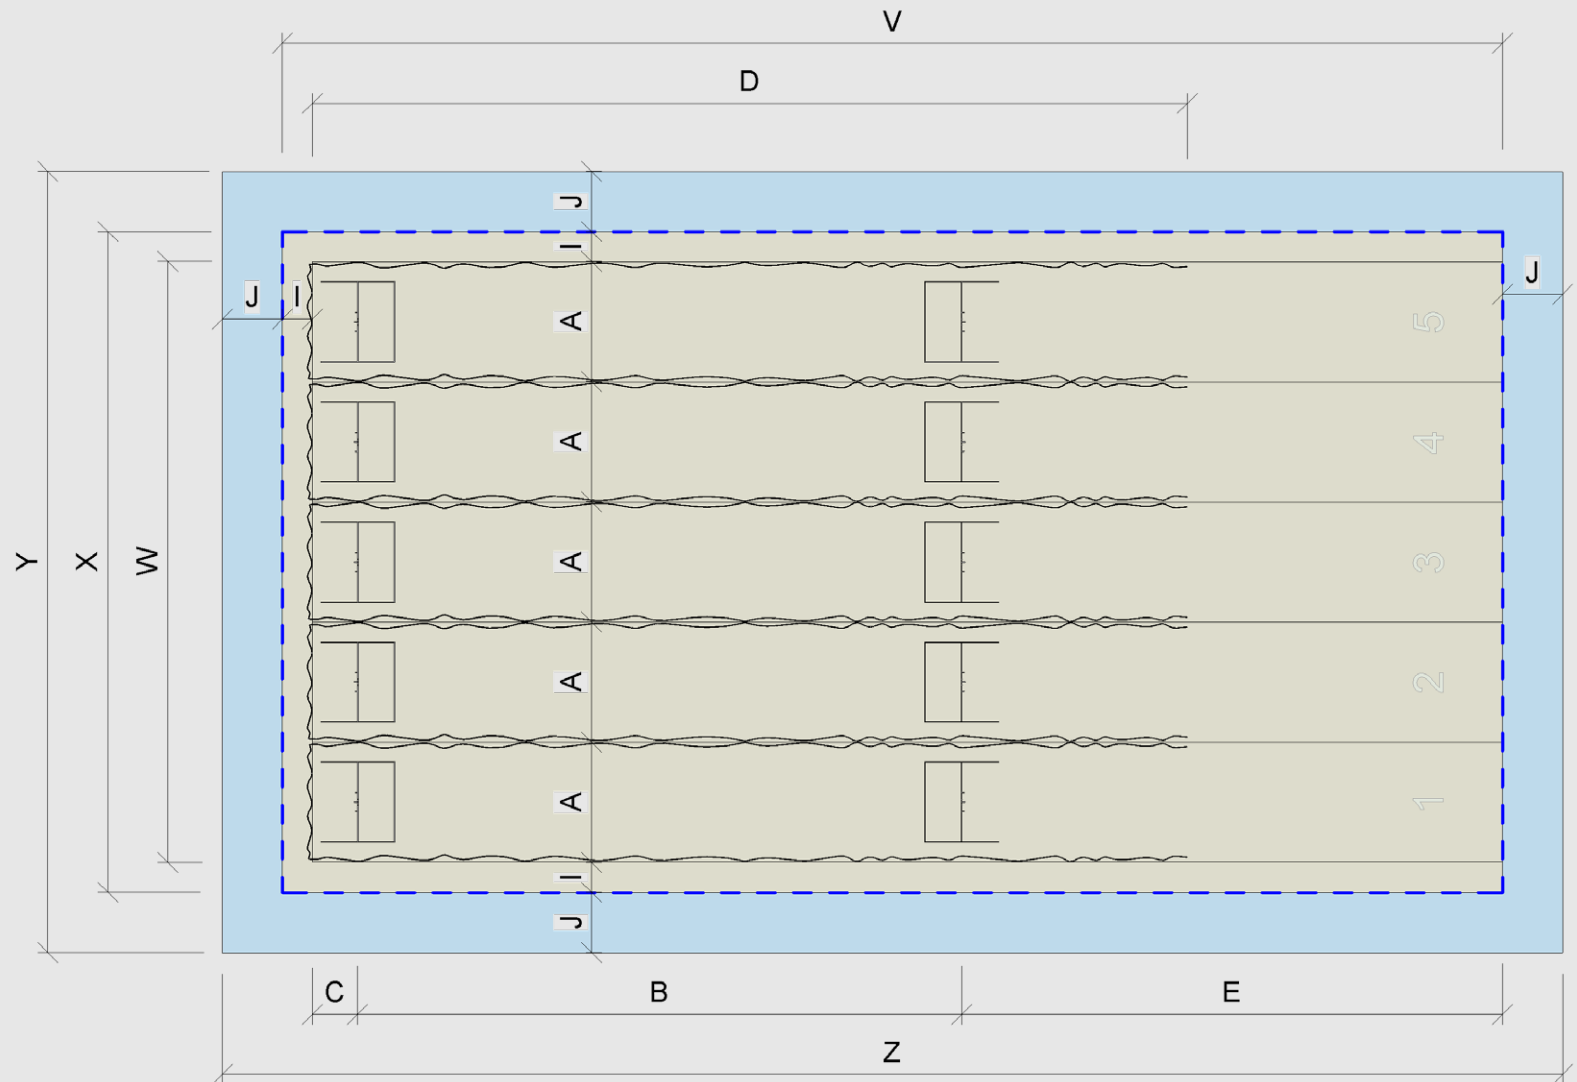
Plan diagram shows an example five-lane Covered Outdoor Cricket Facility with a longer 18 m run up which also creates additional playing space.
